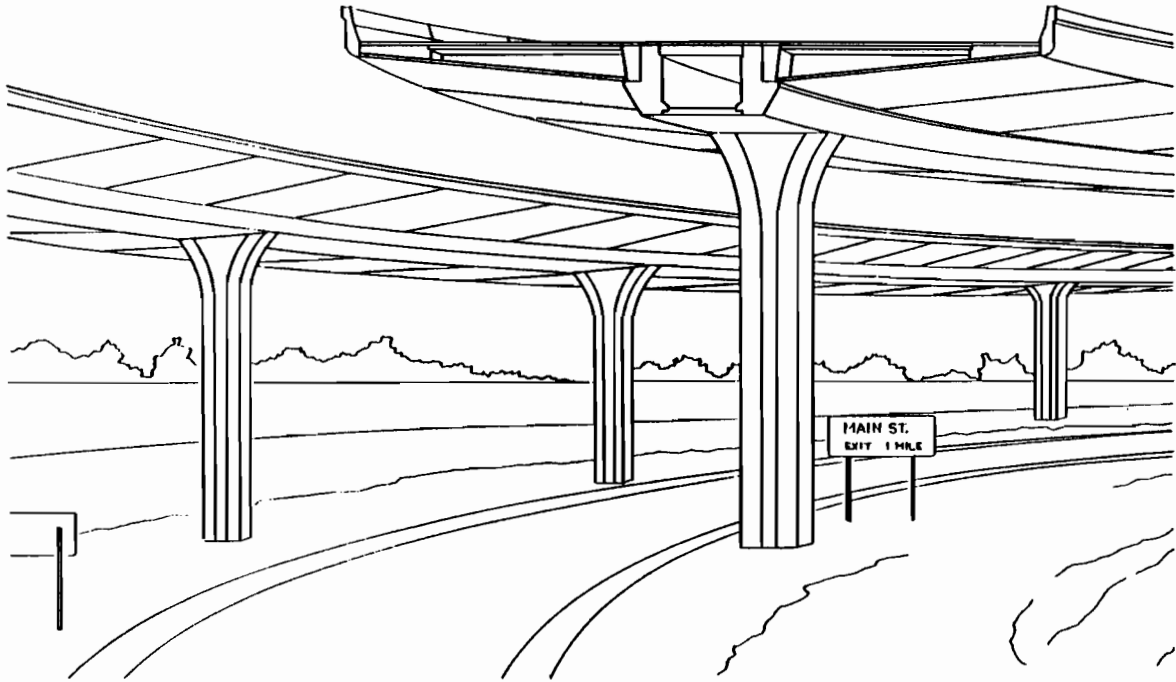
Proposed composite wing girder design featuring a partial cast-in-place spine beam and precast wings
